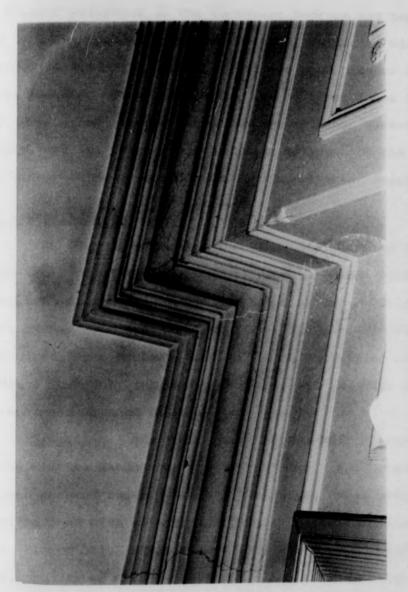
Decorative Plaster at Ceiling and Wall Intersection
